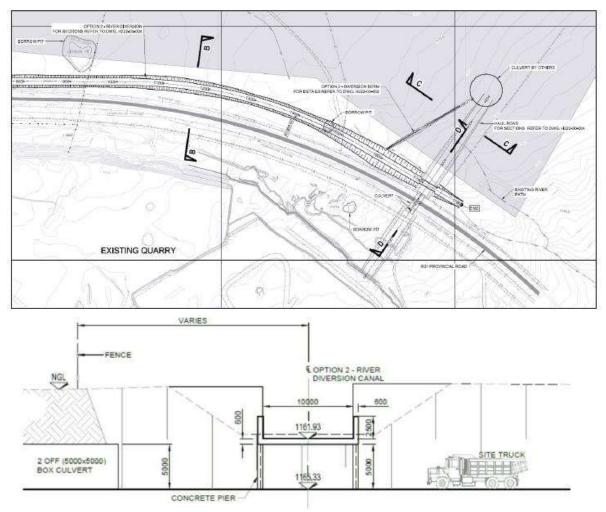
Stream crossing over access road by means of an aqueduct / bridge structure.
